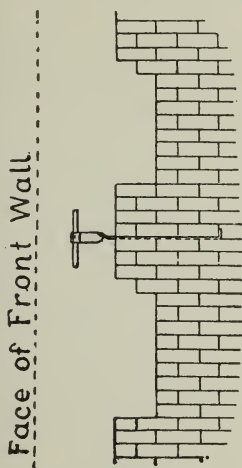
Toothings and Anchoring of Side Brick Walls.
